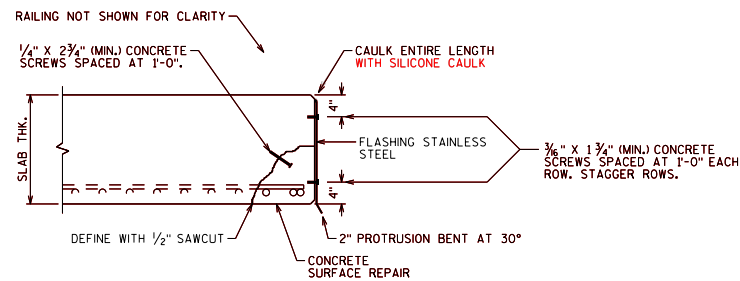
DETAIL FOR CONCRETE SLAB BRIDGE SIMILAR
